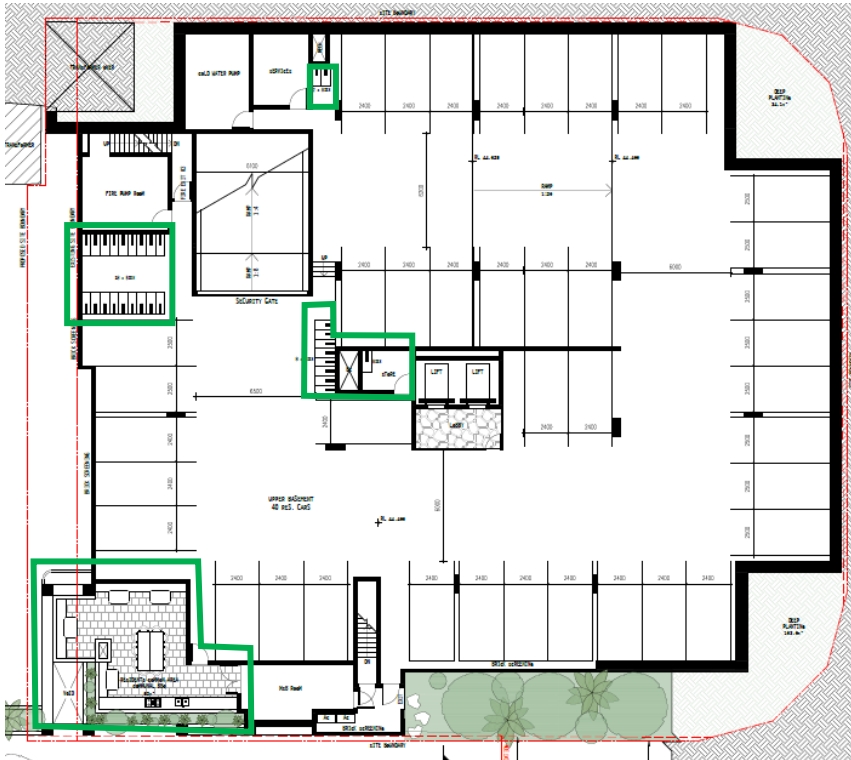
Proposed Basement 02 Floor Plan (Key Changes identified in Green)
